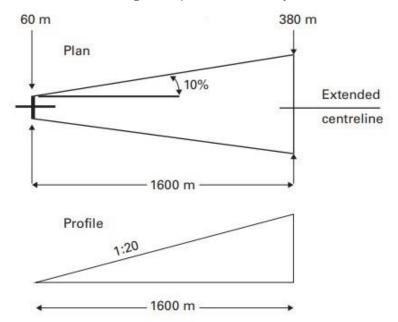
The take-off climb surface plan view dimensions, and applicable profile gradient for a code 1 (visual) runway. (UK CAA CAP 168)
